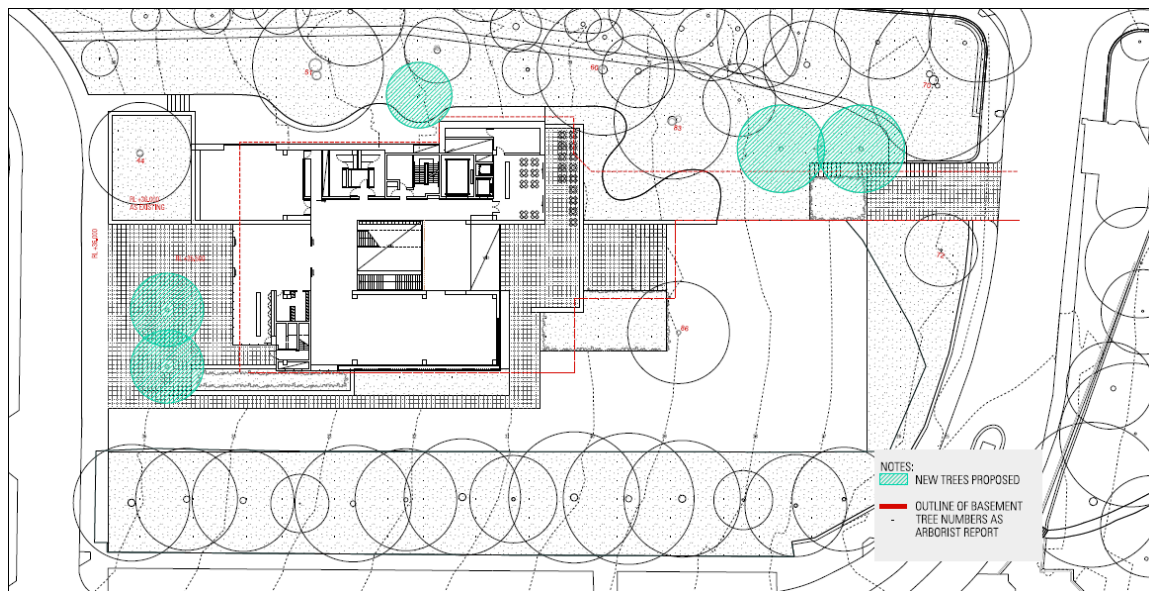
Excerpt from Basement Extent Plan (JPW-SK-0127) showing proposed building location and alignment of basement edge. New trees proposed are indicative only and the final landscape design may differ from the image above. Source: JPW Architects, 30.03.2017
